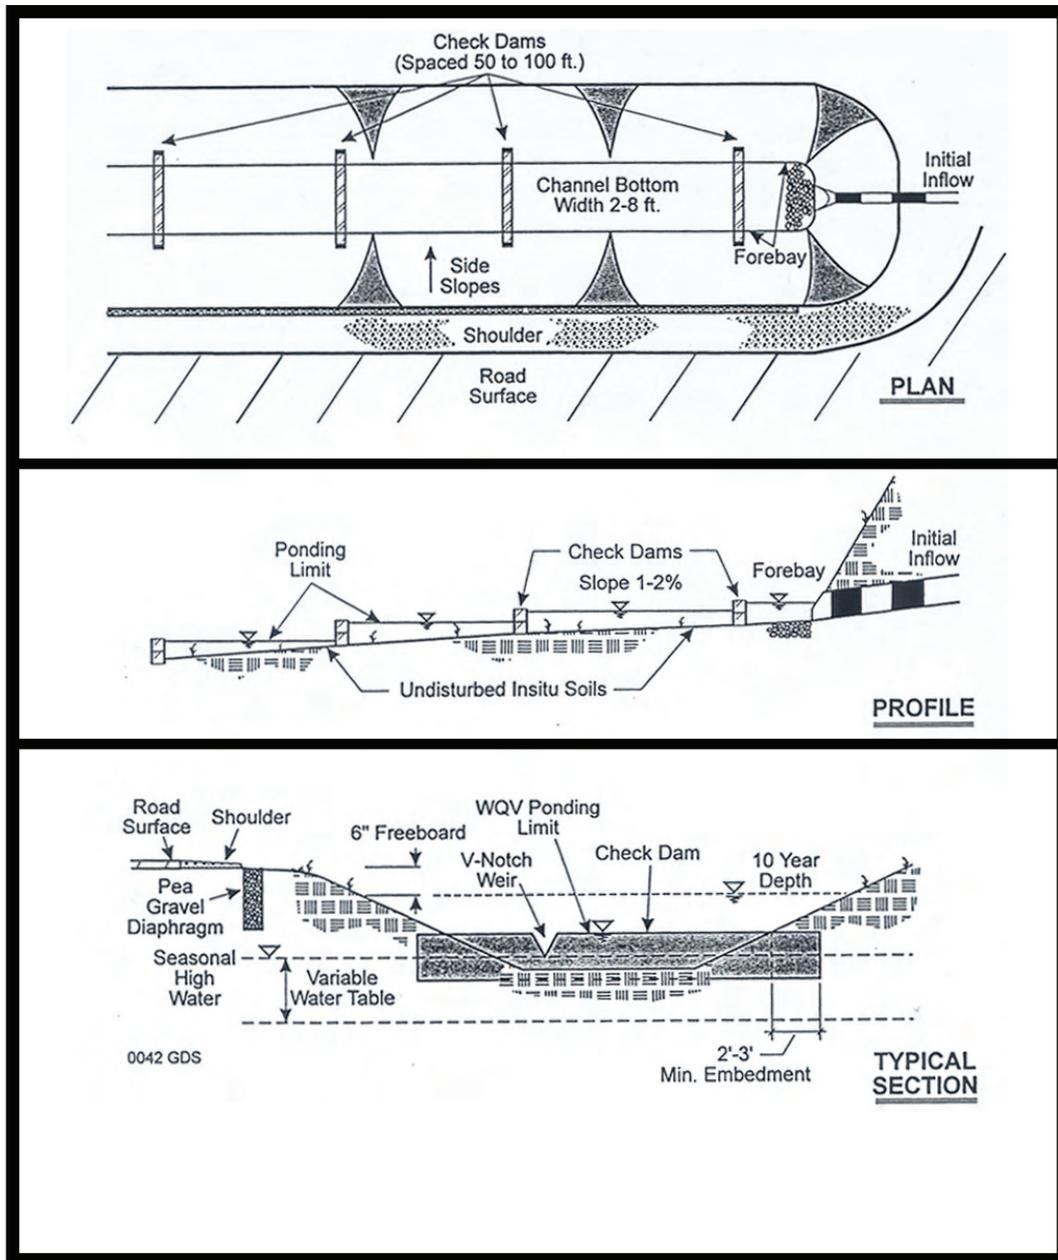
Wetland Swale Plan and Profile Example
